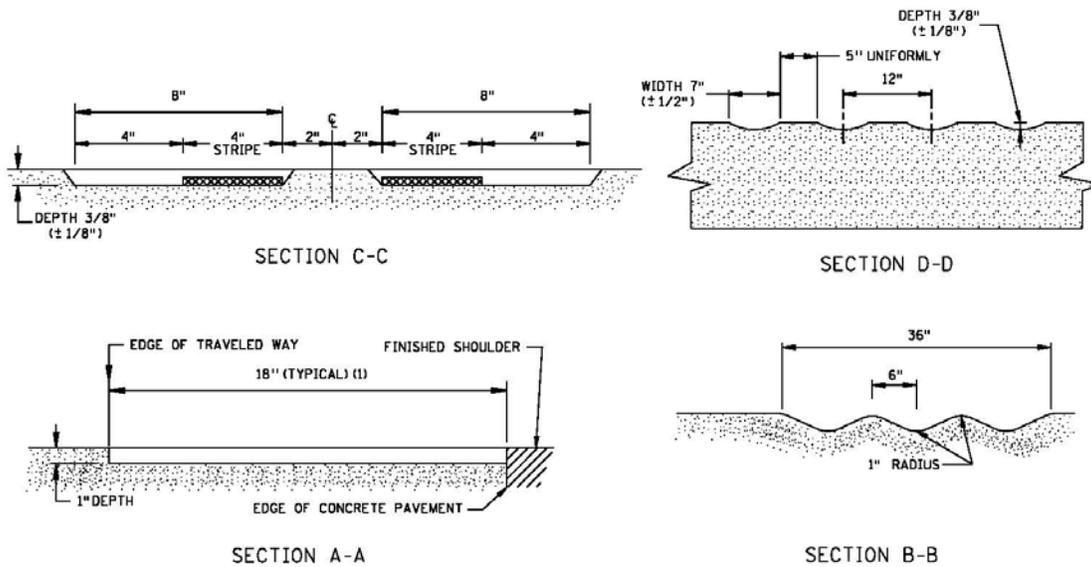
CONCRETE PAVEMENT OPTION A - STRUCTURAL RUMBLE STRIP
